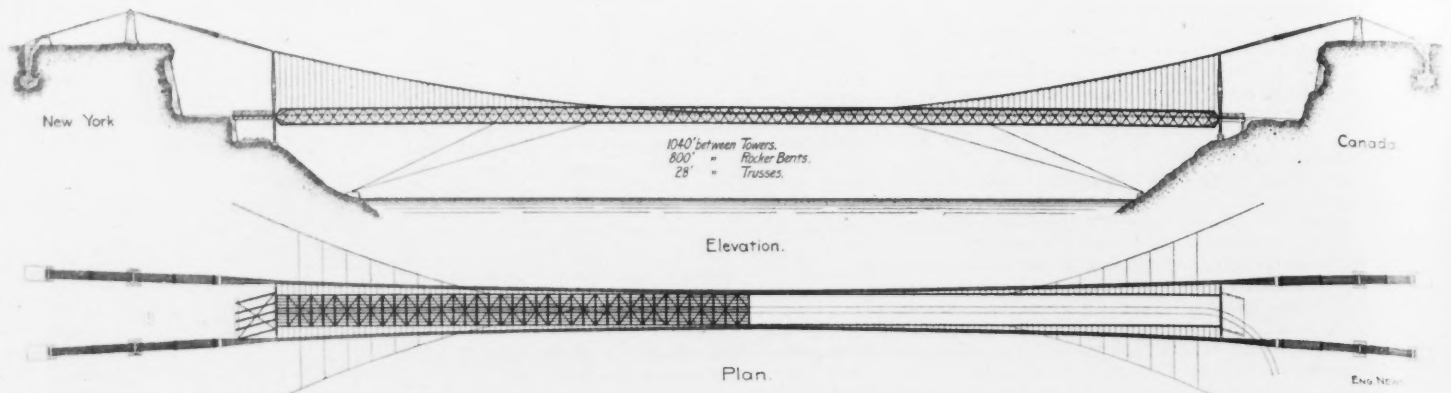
NEW 800-FT. SPAN, LEWISTON & QUEENSTON SUSPENSION BRIDGE ACROSS THE NIAGARA RIVER.
